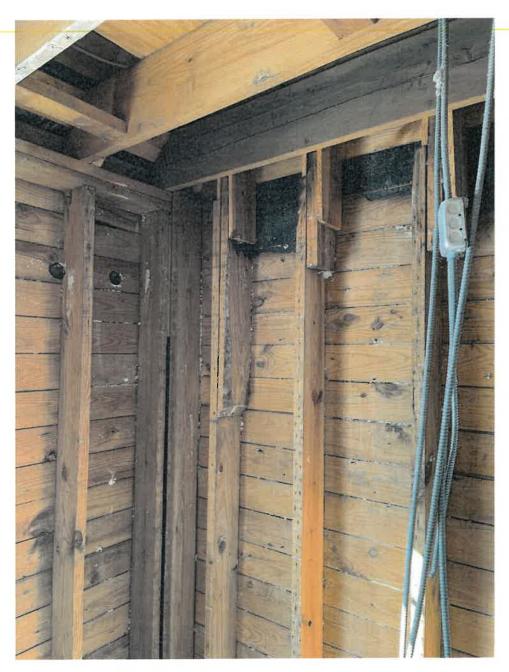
North Wing (Second Floor) – Balloon framing at north wall. Vertical framing scabbed and spliced, should be continuous vertical members. Charred remains indicate evidence of prior fire. Structural failure on ceiling framing. No fire blocking between second floor and attic. Water damage evident on backside of sheathing boards. Consistent air gaps in wall sheathing pose constructability problems for air sealing building envelope.
